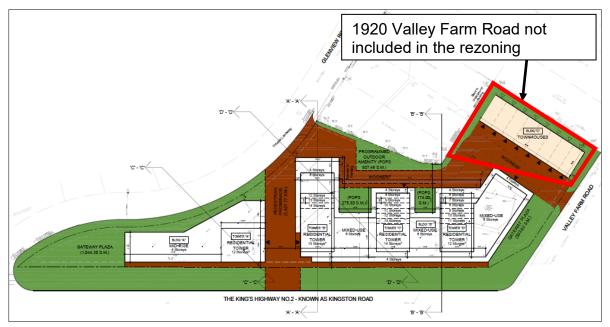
Submitted Conceptual Plan for 1450 Kingston Road
